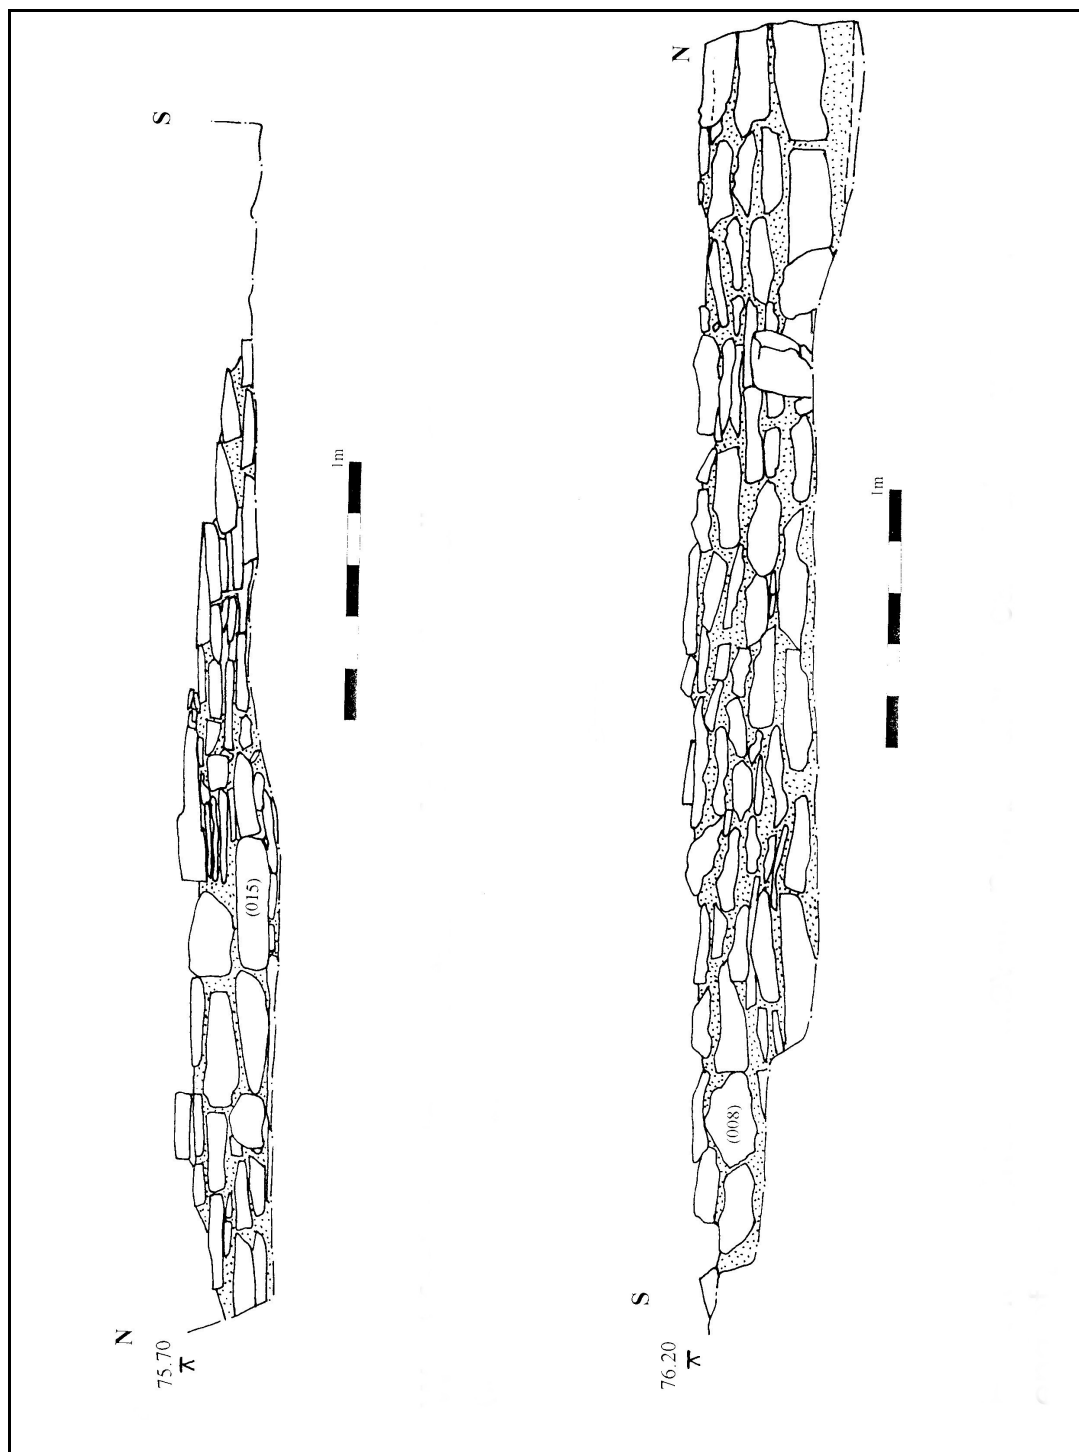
W-facing elevation of Building B (left) and E-facing elevation Building A (right)
